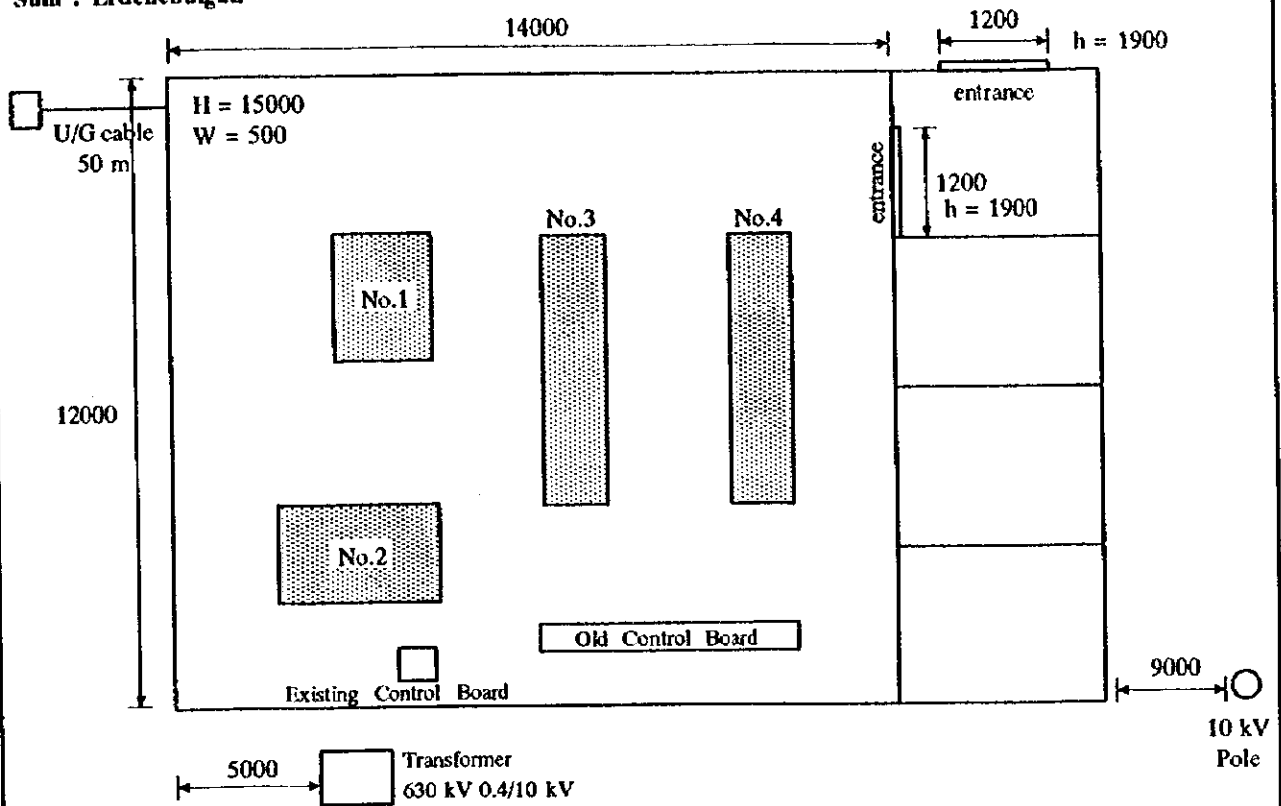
44 Layout Drawing of Renchinlhumbe
